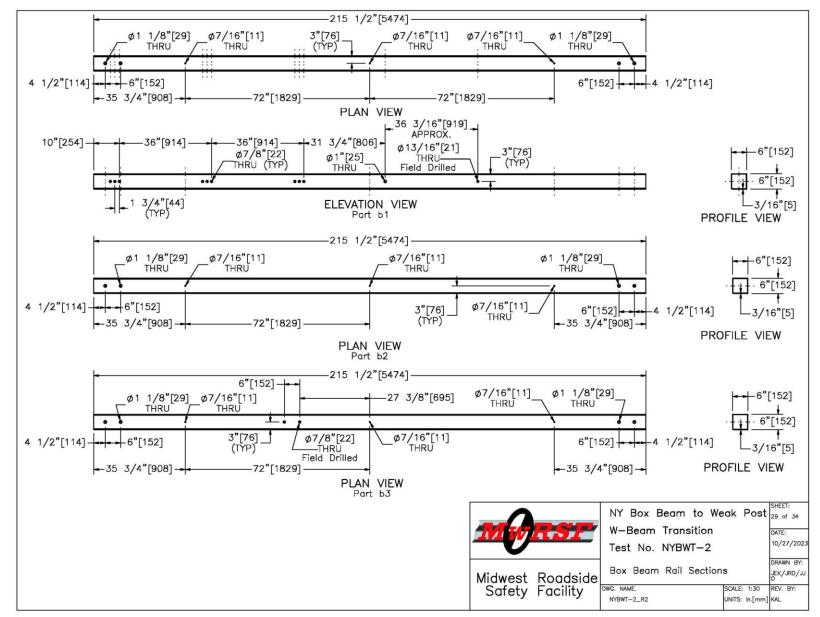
Box Beam Rail Section, Test No. NYBWT-2
